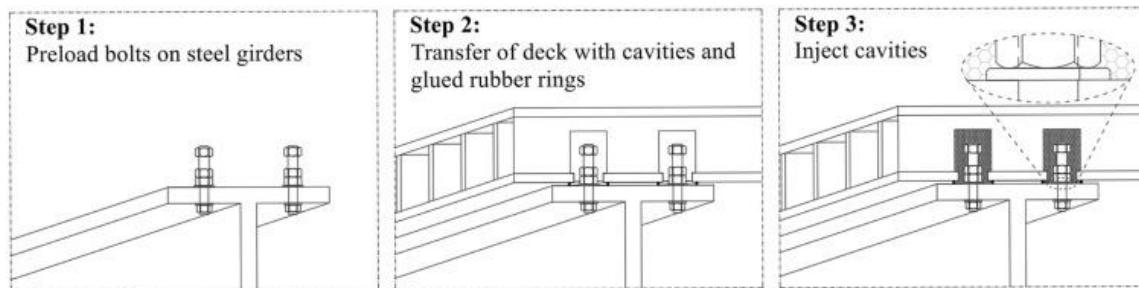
Lindapter bolted connector connecting FRP bridge deck to steel girder (G. Olivier, 2023)
